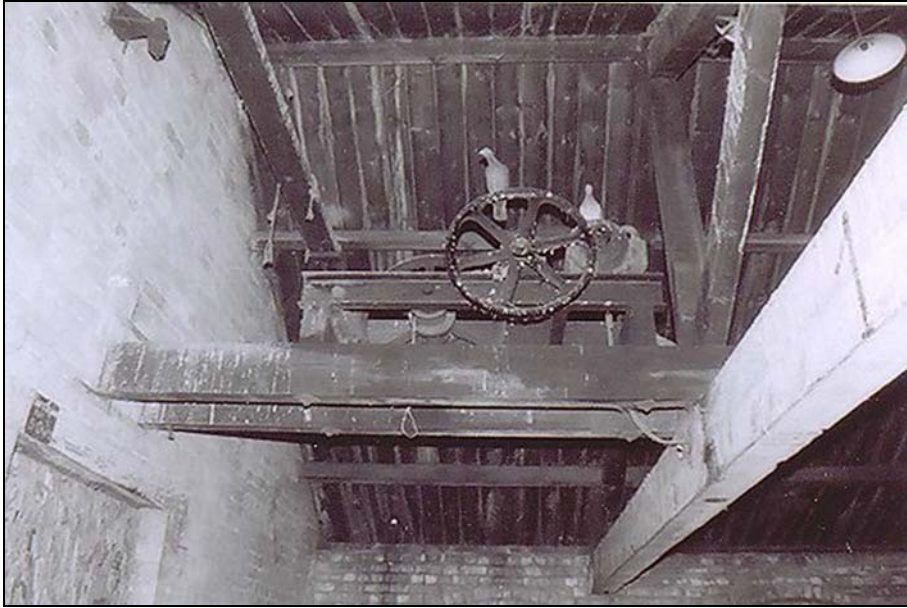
Warehouse annexe, hoist detail. Looking north-west.
